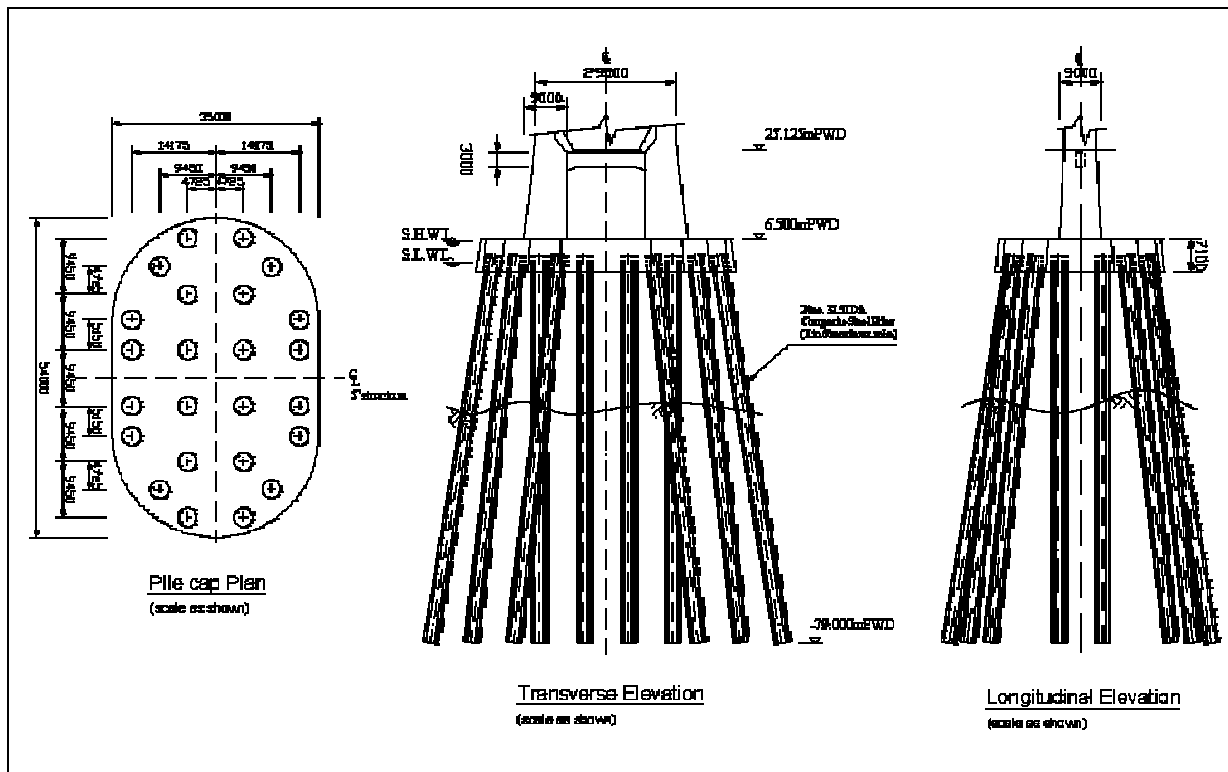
General Arrangement of River Substructure for Cable Stayed Tower (Alternative-H2)
